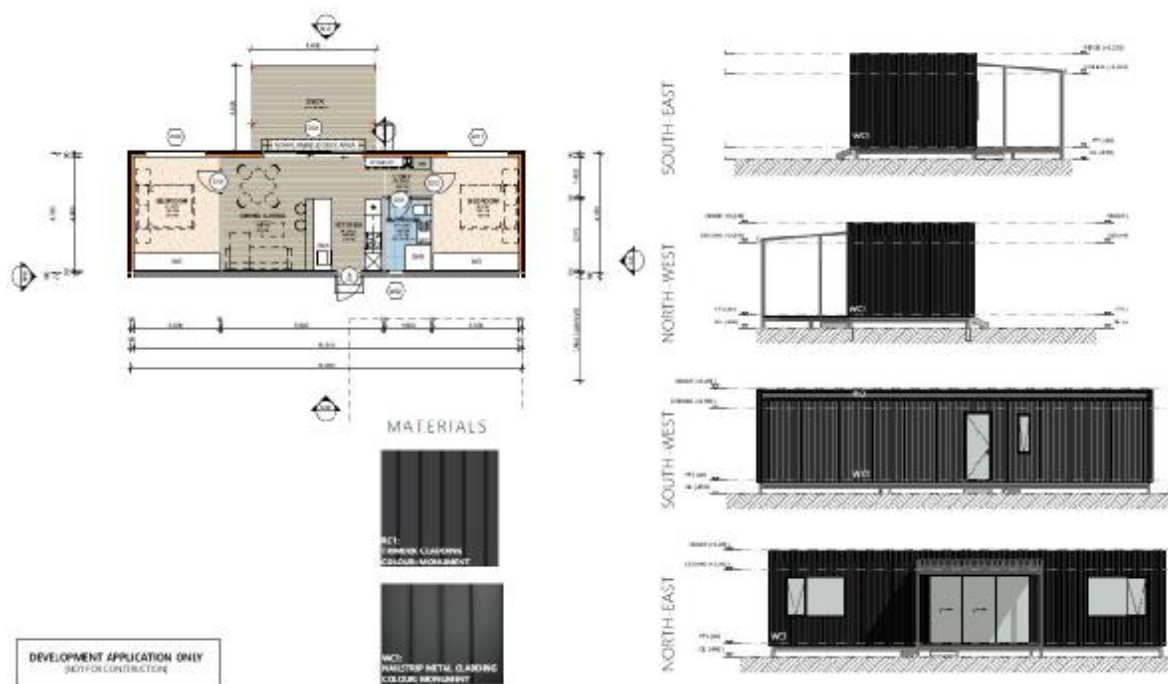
Proposed ancillary dwelling floor plan & elevations (Wilkin Design, drawing NSTH-011, 22/07/2025)
